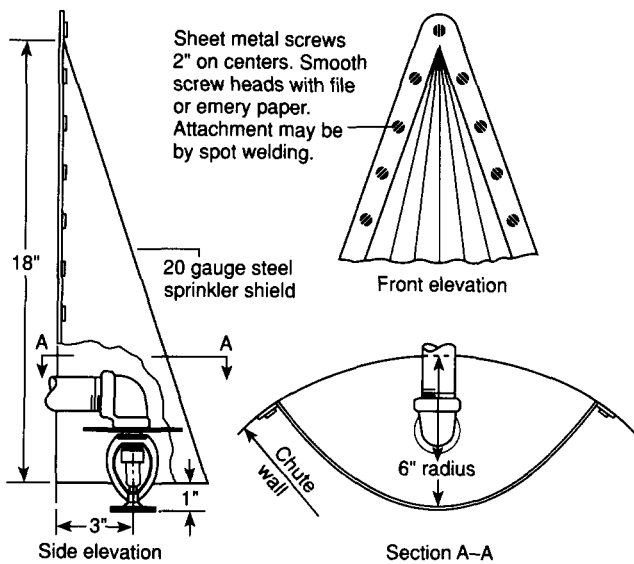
Canopy for protecting sprinklers in building service chutes.
